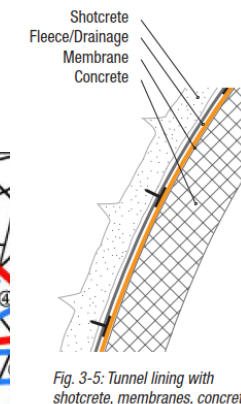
Tunnel lining with shotcrete, membranes, concrete
